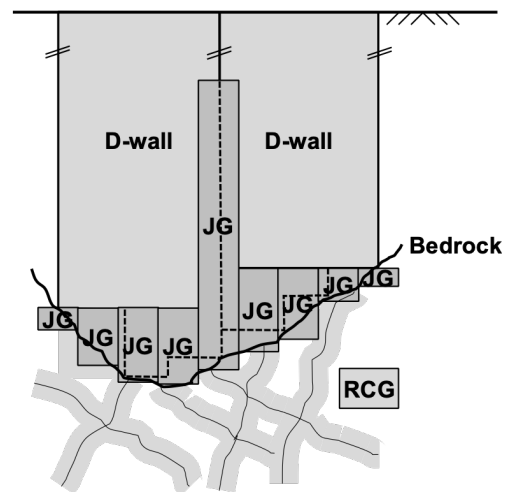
Side view of jet-grouting (JG) works for underpinning and sealing purpose plus rock curtain grouting (RCG) works.
